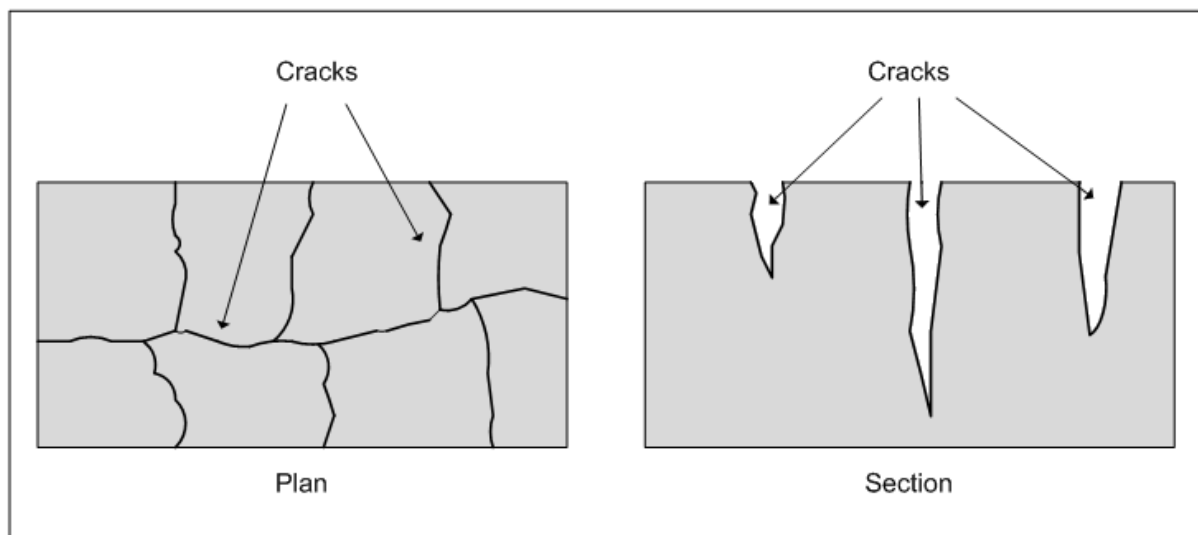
Typical plastic shrinkage cracks (Illston *et al.*, 2001:138)
